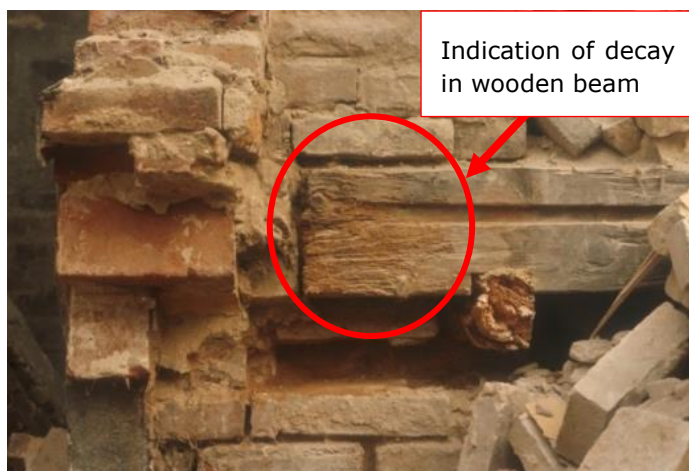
Example of wooden decay/rot of wooden beam end in lower storeys of facade wall. Photo courtesy of J. Engelmark.
